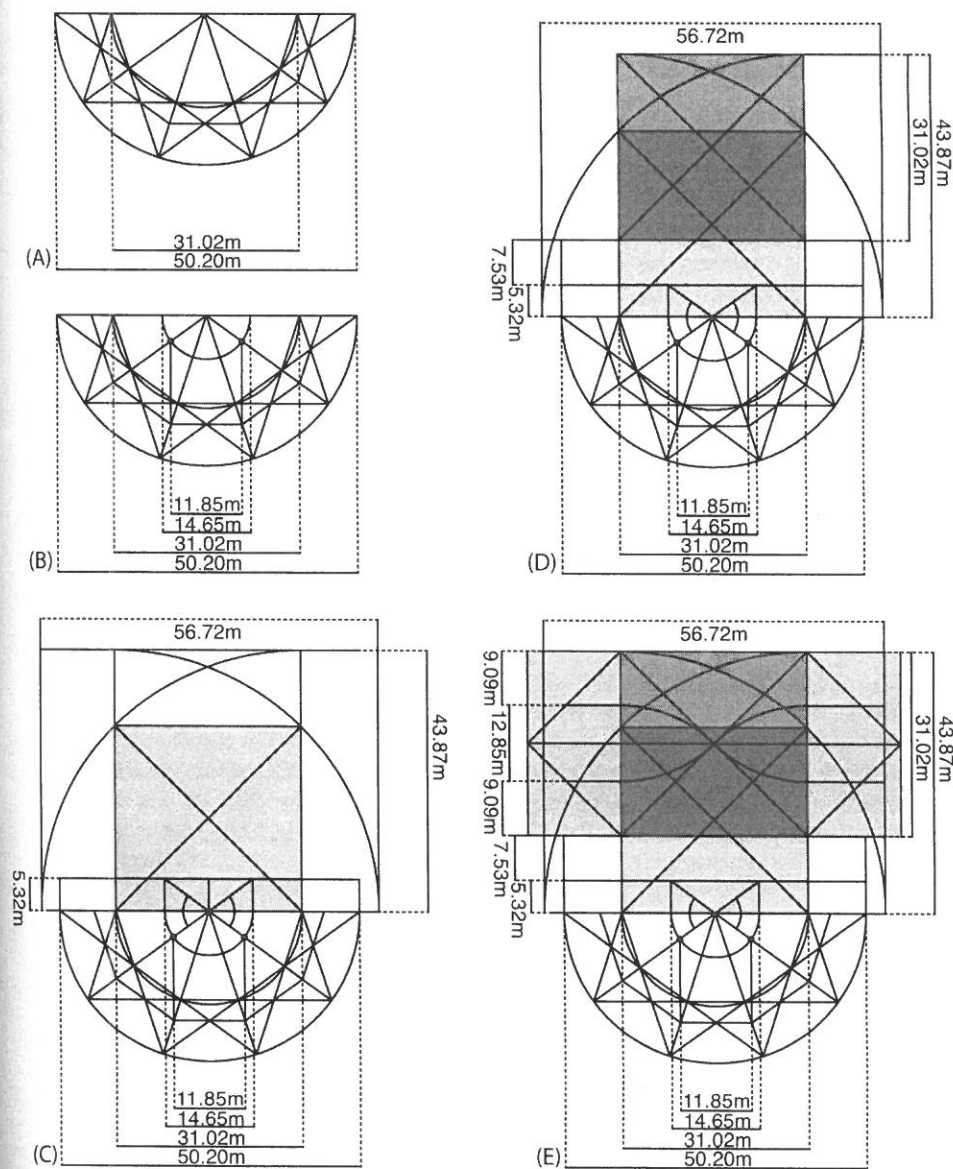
Reims, Cathedral of Notre-Dame: schematic plans showing likely steps in layout of the east end and transept zone
